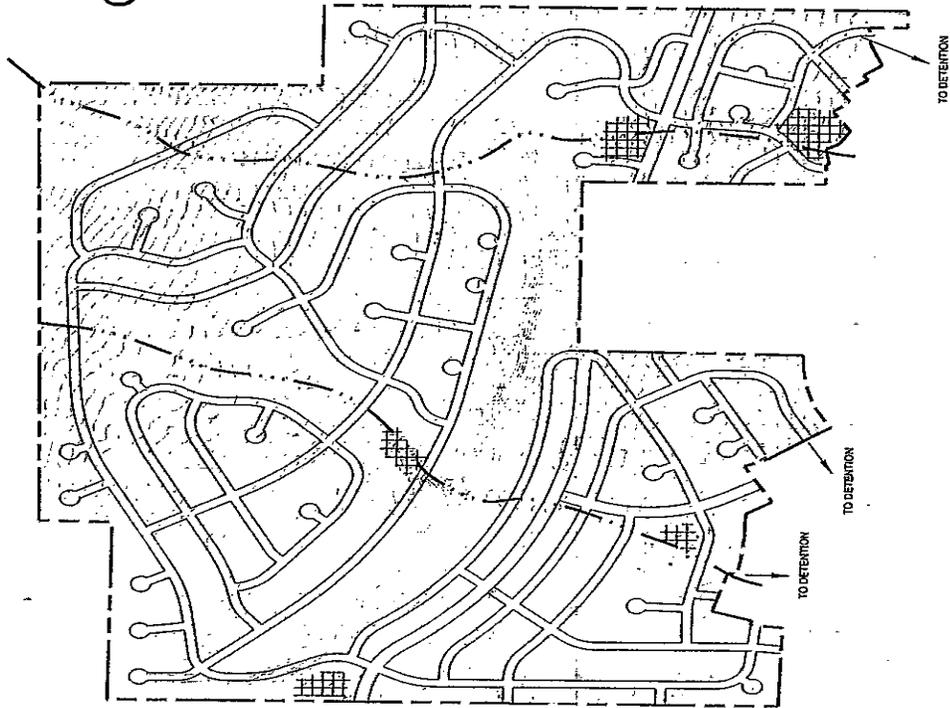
EXHIBIT I NORTH VIEW ESTATES CONCEPTUAL STORM DRAIN PLAN
